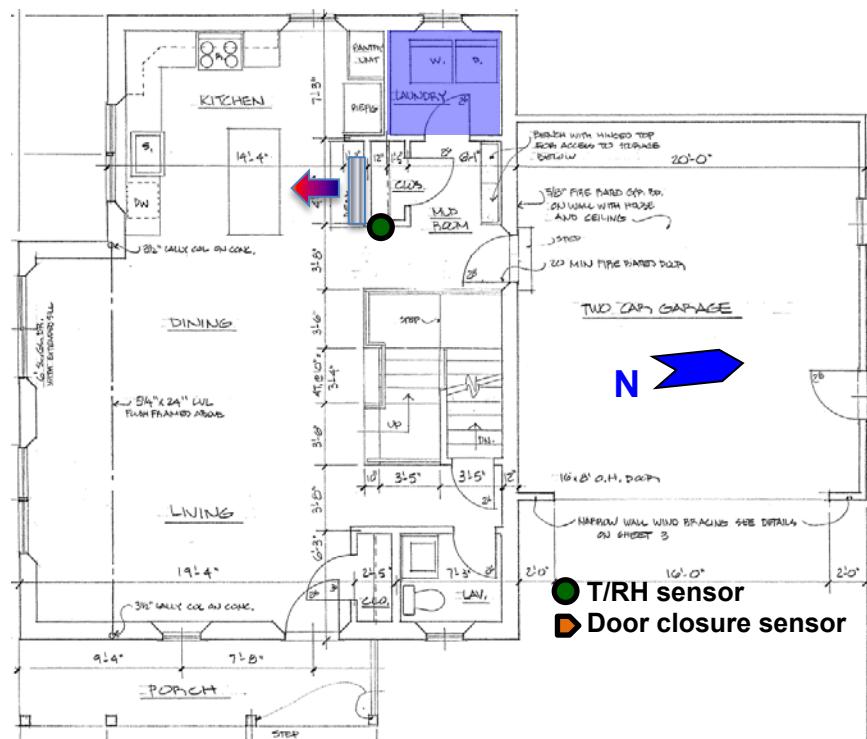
Easthampton Lot 30 floor plans, MSHP locations, monitoring locations
